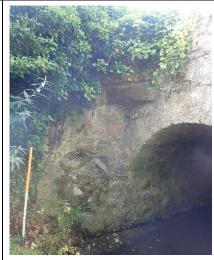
Downstream side of southern arch showing cutwater and rebuilt stonework above cutwater
